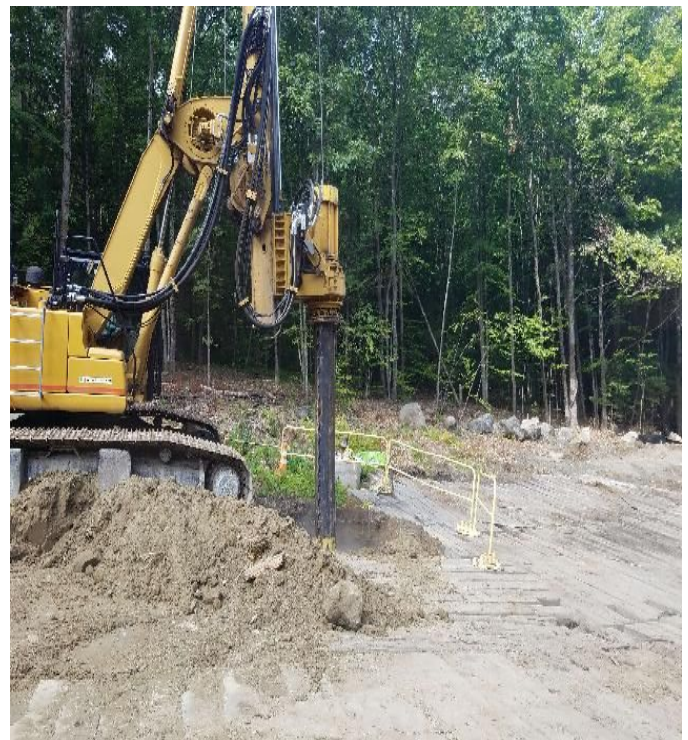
MJ drilling Str. 29. Viewing west. (9-4-19).
